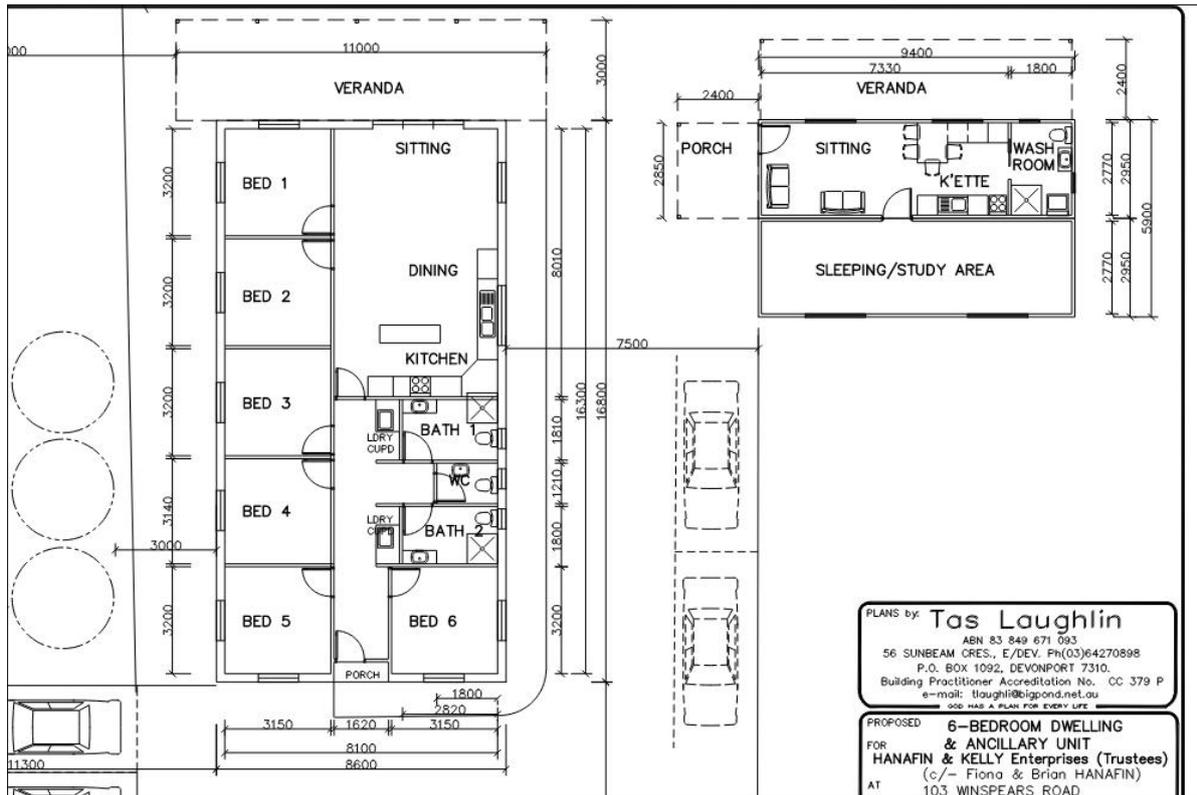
Floor plan of single dwelling and ancillary residence (Tas Laughlin, 2021)
